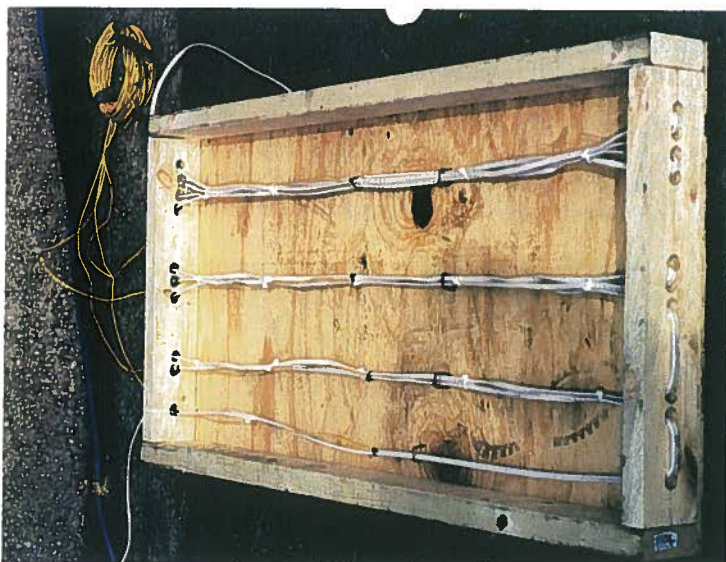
Test panels were constructed using standard framing lumber and 1/4" plywood. Initial testing was conducted on both #12 and #14 AWG type NM cables. Photo shows a test jig before the insulation was injected.
